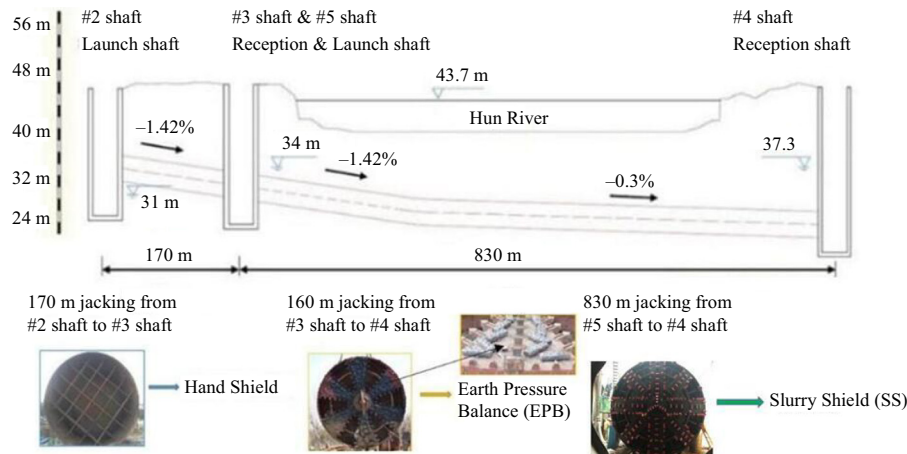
Elevation view of the pipe jacking project of Wu'ai Electric Power Tunnel.
